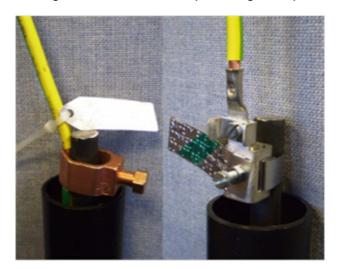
Securing Earth Cable via Strap or Ring Clamp
